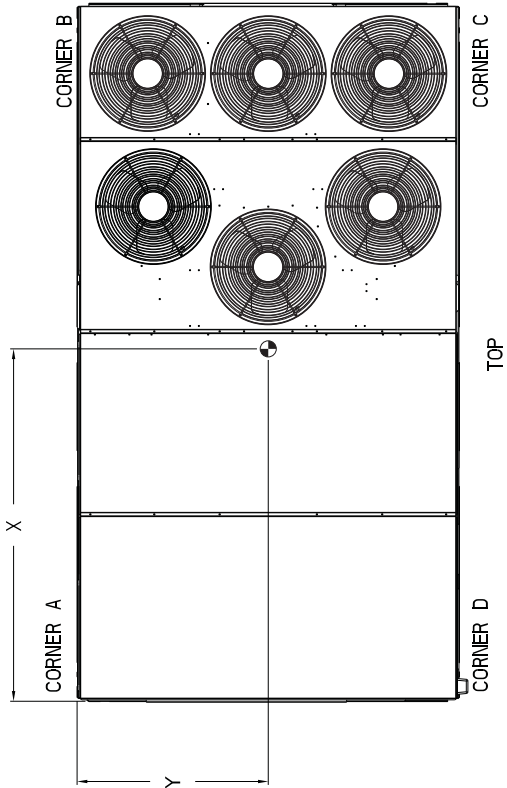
48FC30 Base Unit Dimensions (cont)
